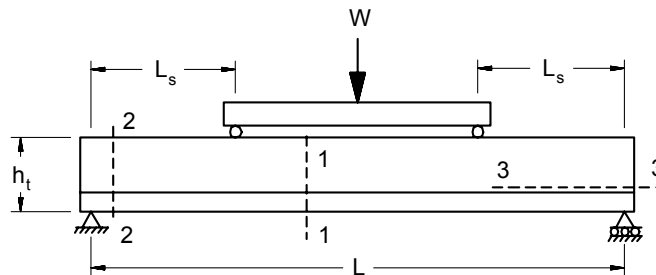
Modes of failure of composite slab (Johnson, 1994)
